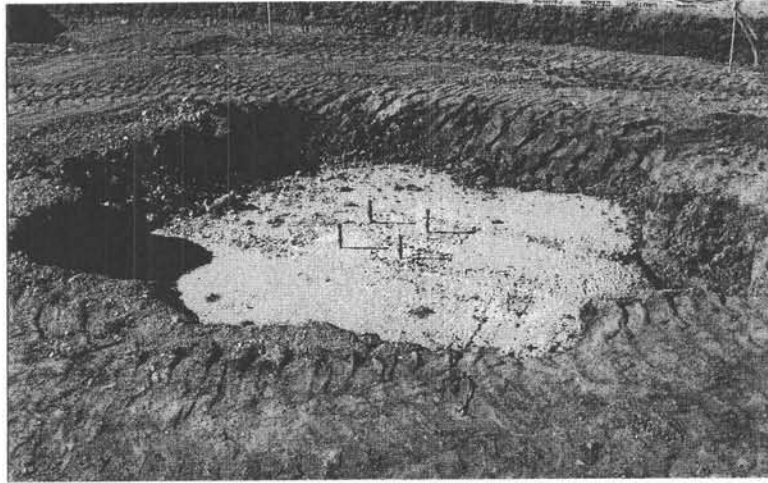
A completed spread footing. The four bolts extending out of the footing will be connected to the base plate of a steel column.
